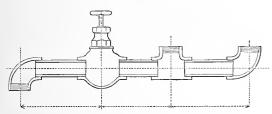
DIAGRAM SHOWING SCREWED JOINTS.
